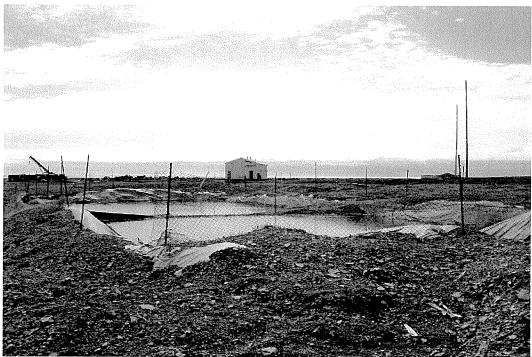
View of the East Module Train Holding Pond at PIN-3 on 10 July 2003. The photo was taken facing south. Samples 03-07259 and 03-07260/07261 were collected from the north and south sections of the holding pond respectively.
